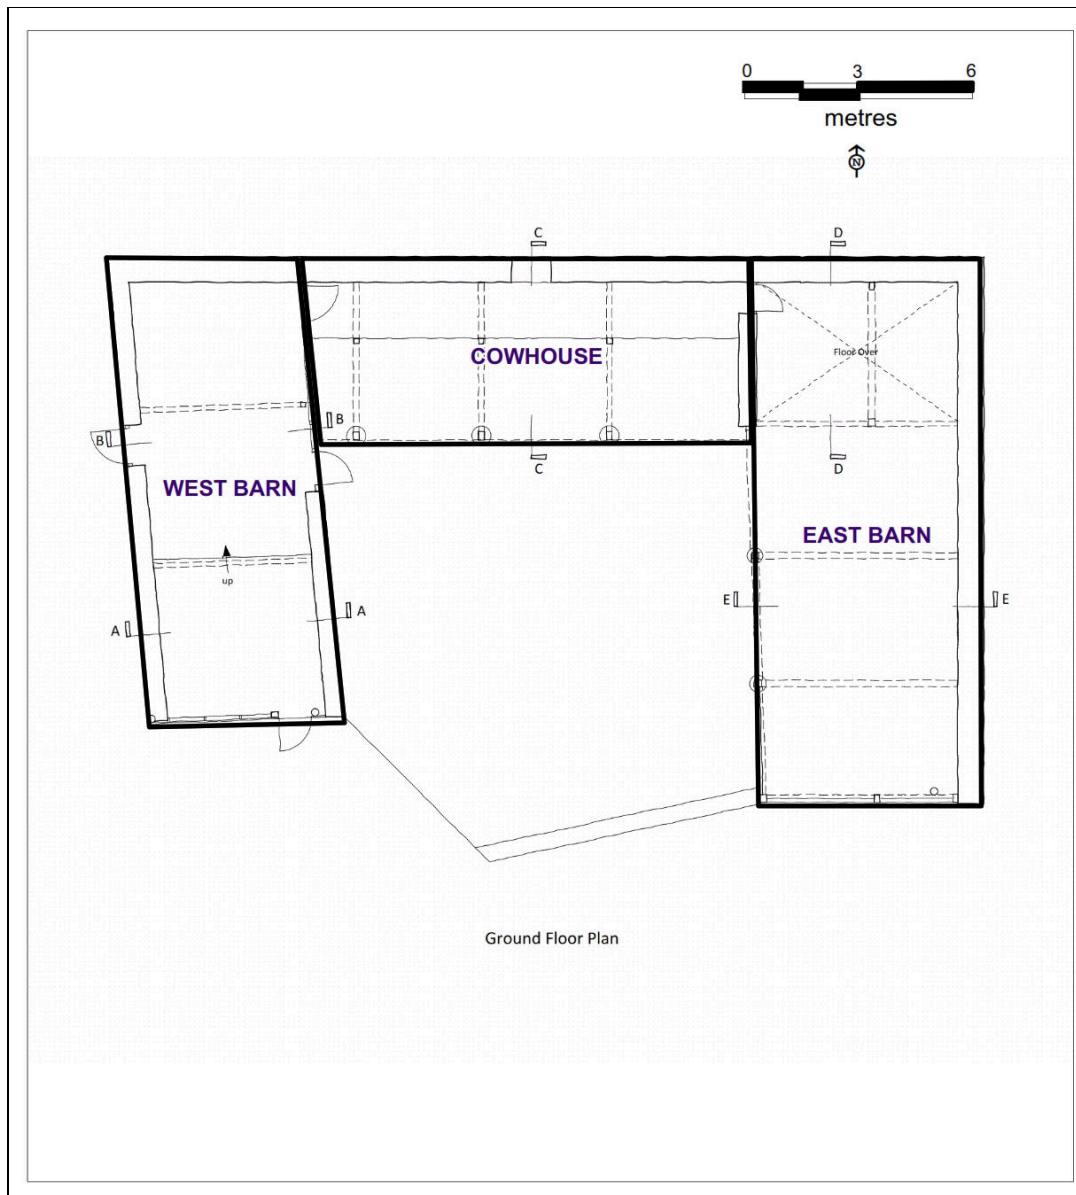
Layout of the former barn complex at Brookhouse Farm based on the ground plan drawn by Bryan Thomas of Architectural Design Ltd, The Malthouse, Shobdon, Leominster.
